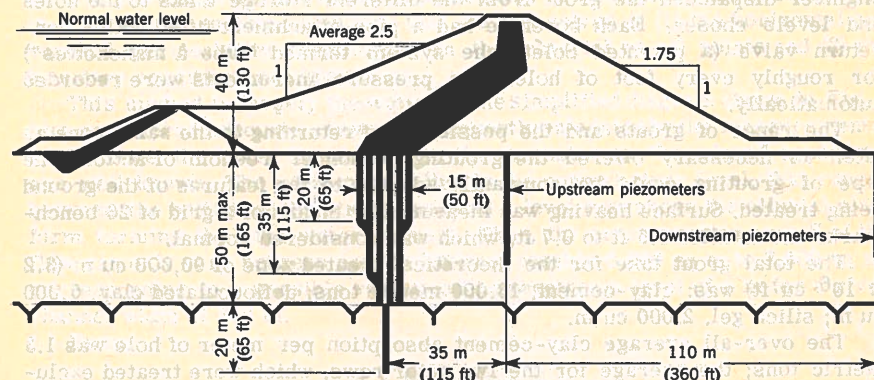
LOCATION OF MAIN PIEZOMETER ROWS IN TYPICAL DAM SECTION
